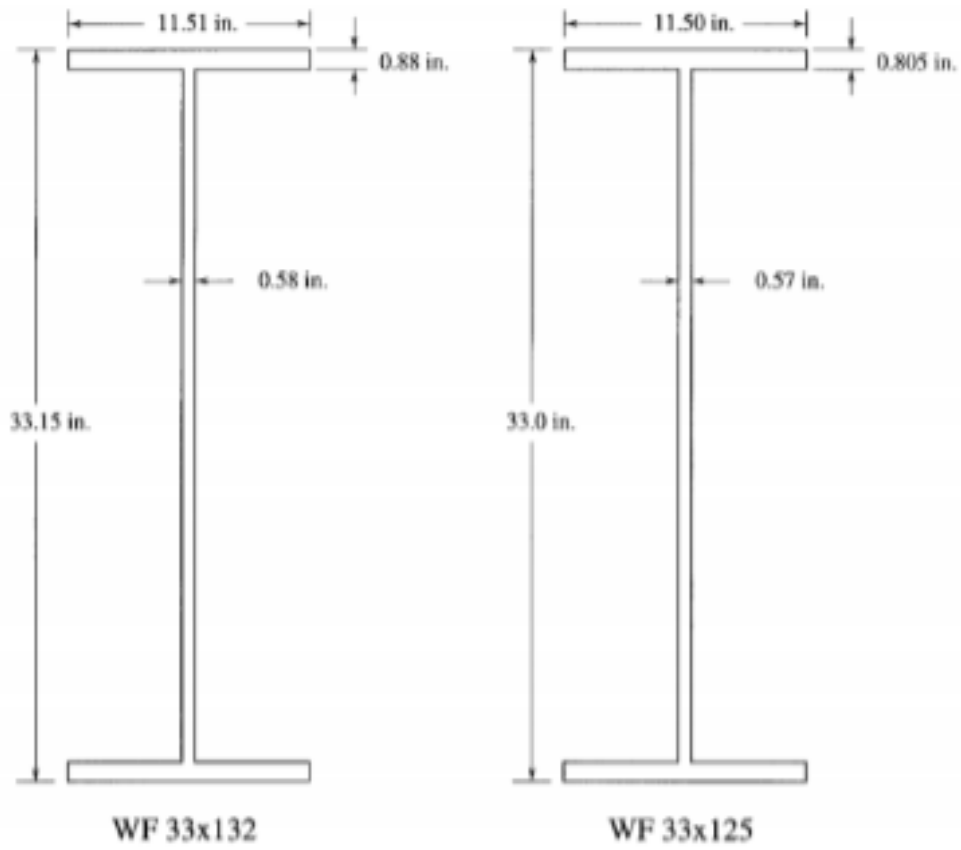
Exterior (right) and Interior (left) Girders of E-17-AH bridge.
